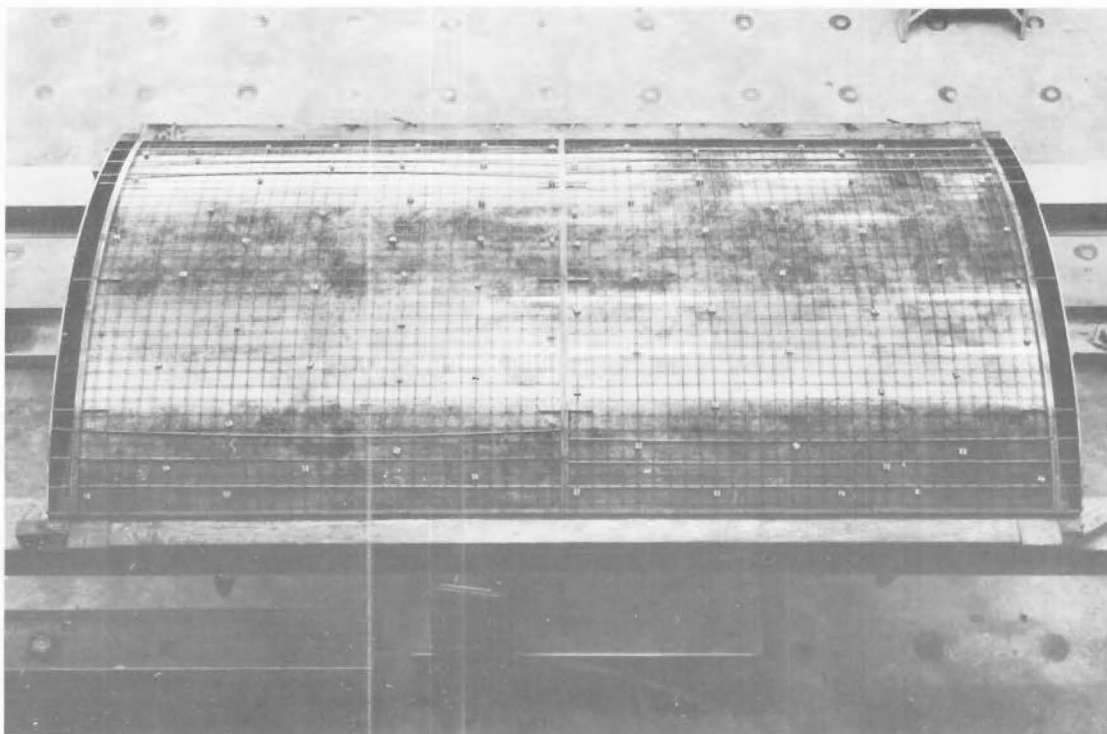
ASSEMBLED SHELL MOULD USED FOR SHELLS 1,2&3.
